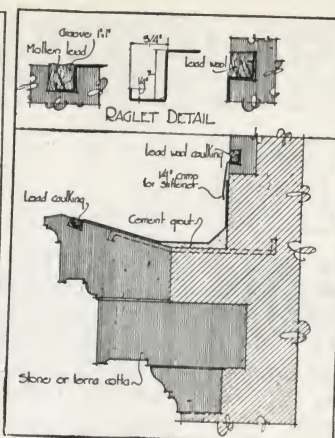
Details Method of Securing and Flashing Gutter Linings on a Stone or Terra Cotta Bed
